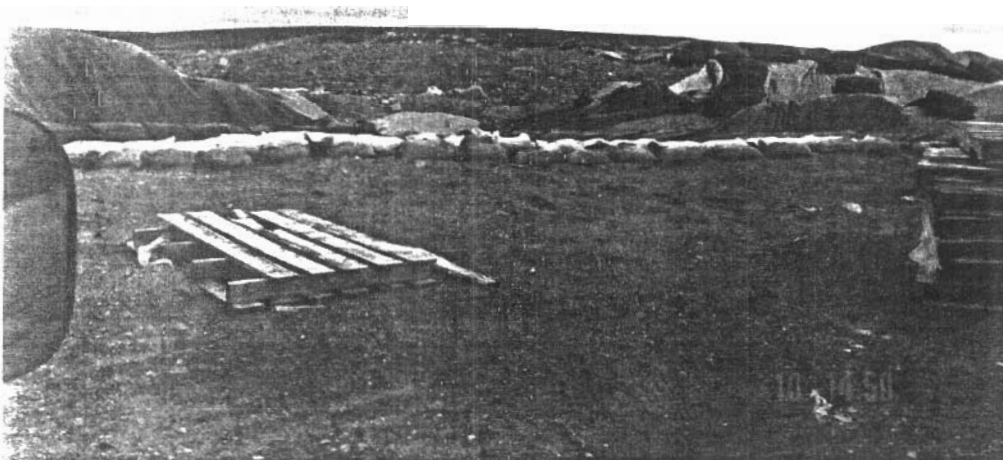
Contaminated Soil Reclamation area located by Old Solid Waste Disposal area.
